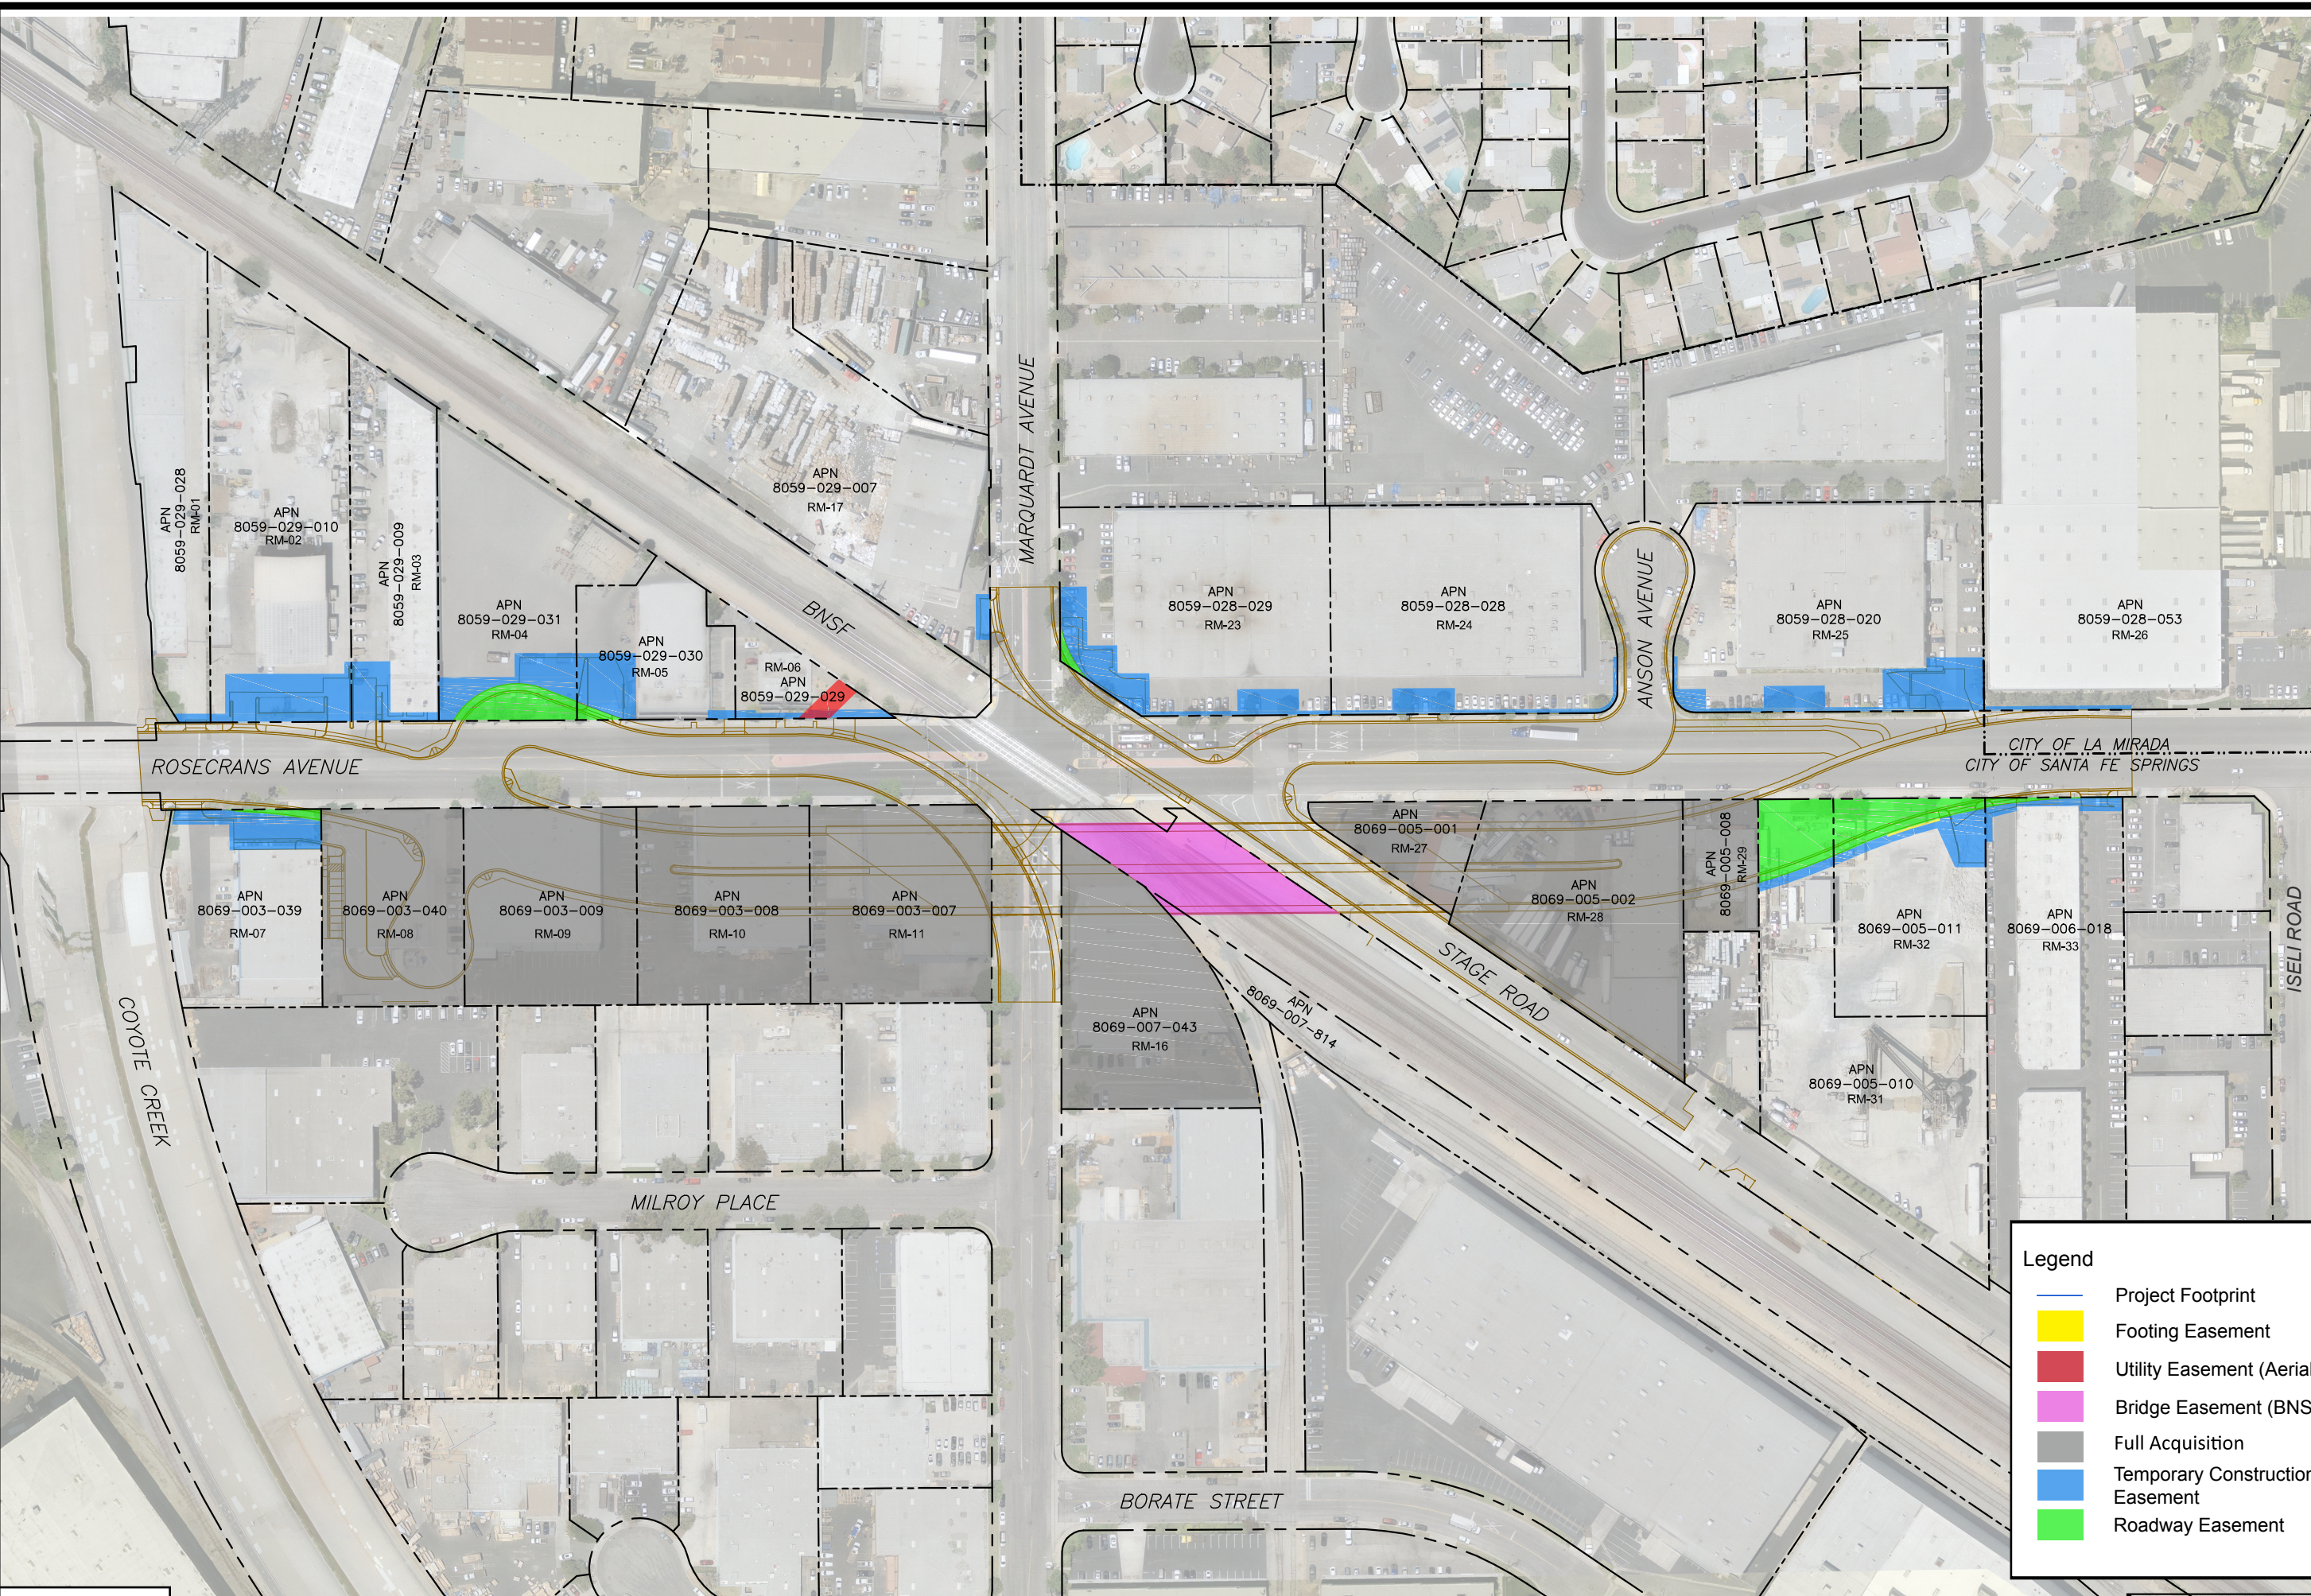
ALTERNATIVE 2-PLAN VIEW
